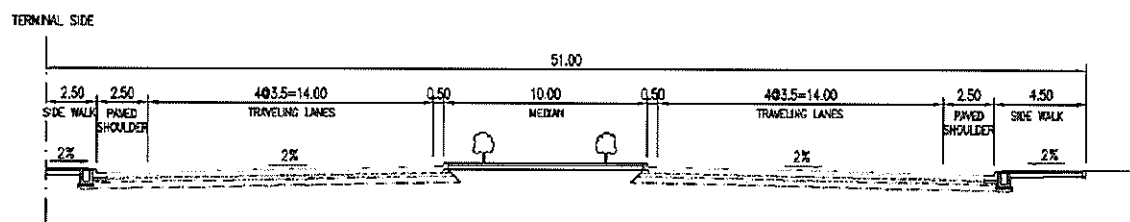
Typical Cross Section of Passing Main Road (Future)
